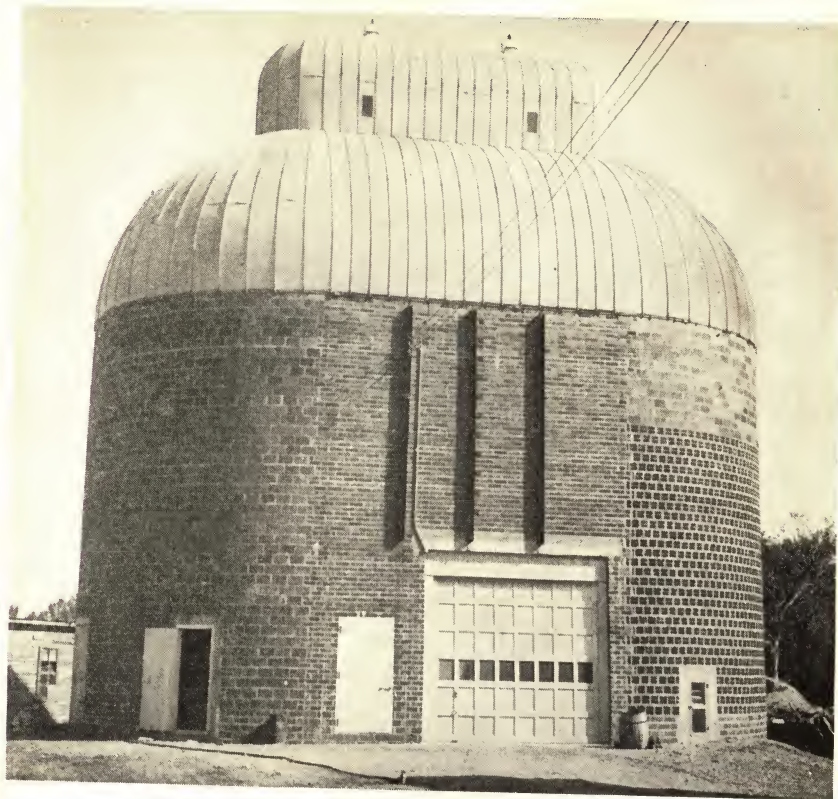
Combination Brick and Clay Tile Storage Elevator
